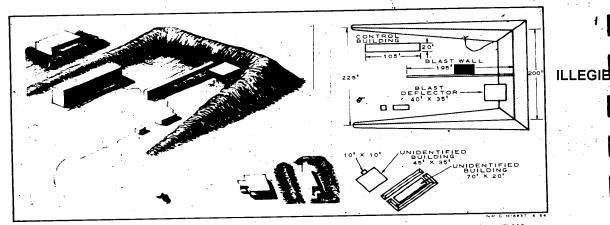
PLAN AND PERSPECTIVE VIEWS OF AIRCRAFT TEST REVETMENT, SHEN-YANG AIRFRAME PLANT 112.
